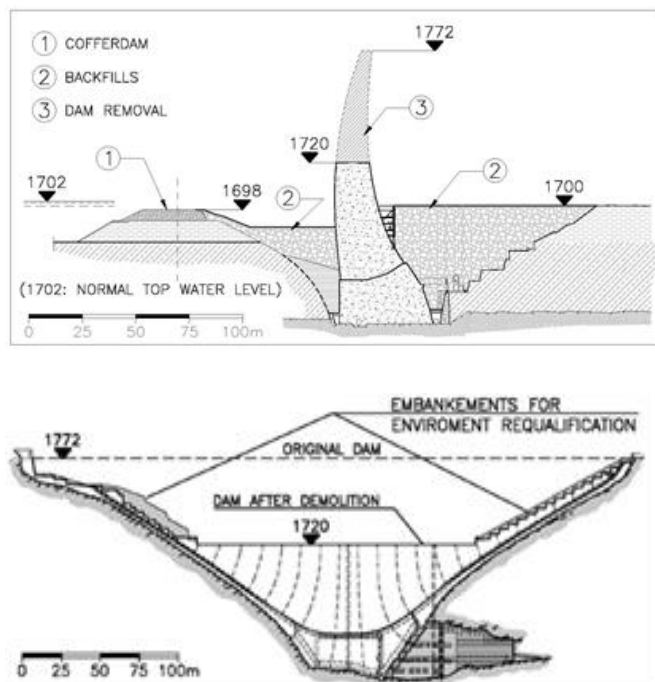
Cross section and downstream view of Beaugard dam after the partial demolition rehabilitation works / Sezione maestra e vista da valle della diga di Beaugard dopo la demolizione parziale.
